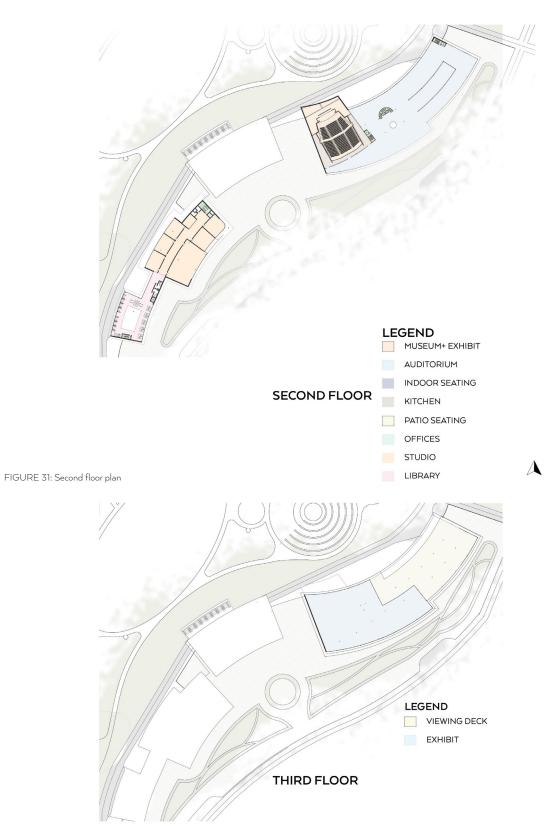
Third floor plan 30 | Miami University | MArch Thesis 2022-23
